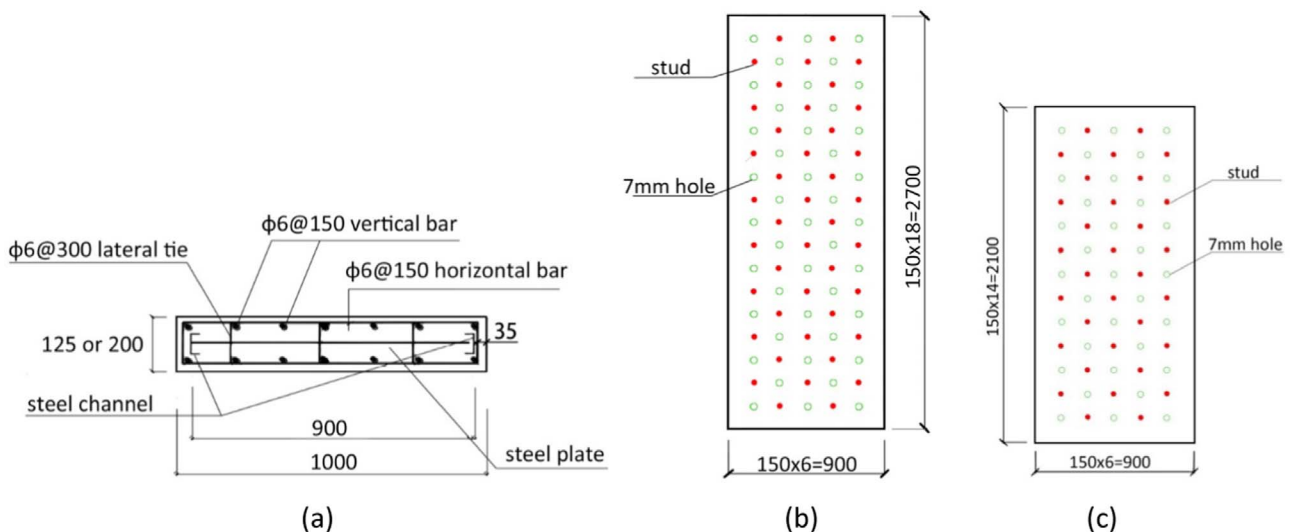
Details of the specimens. (a) Cross section of SPRW; (b) and (c) Details of the steel plates (Units in mm).
